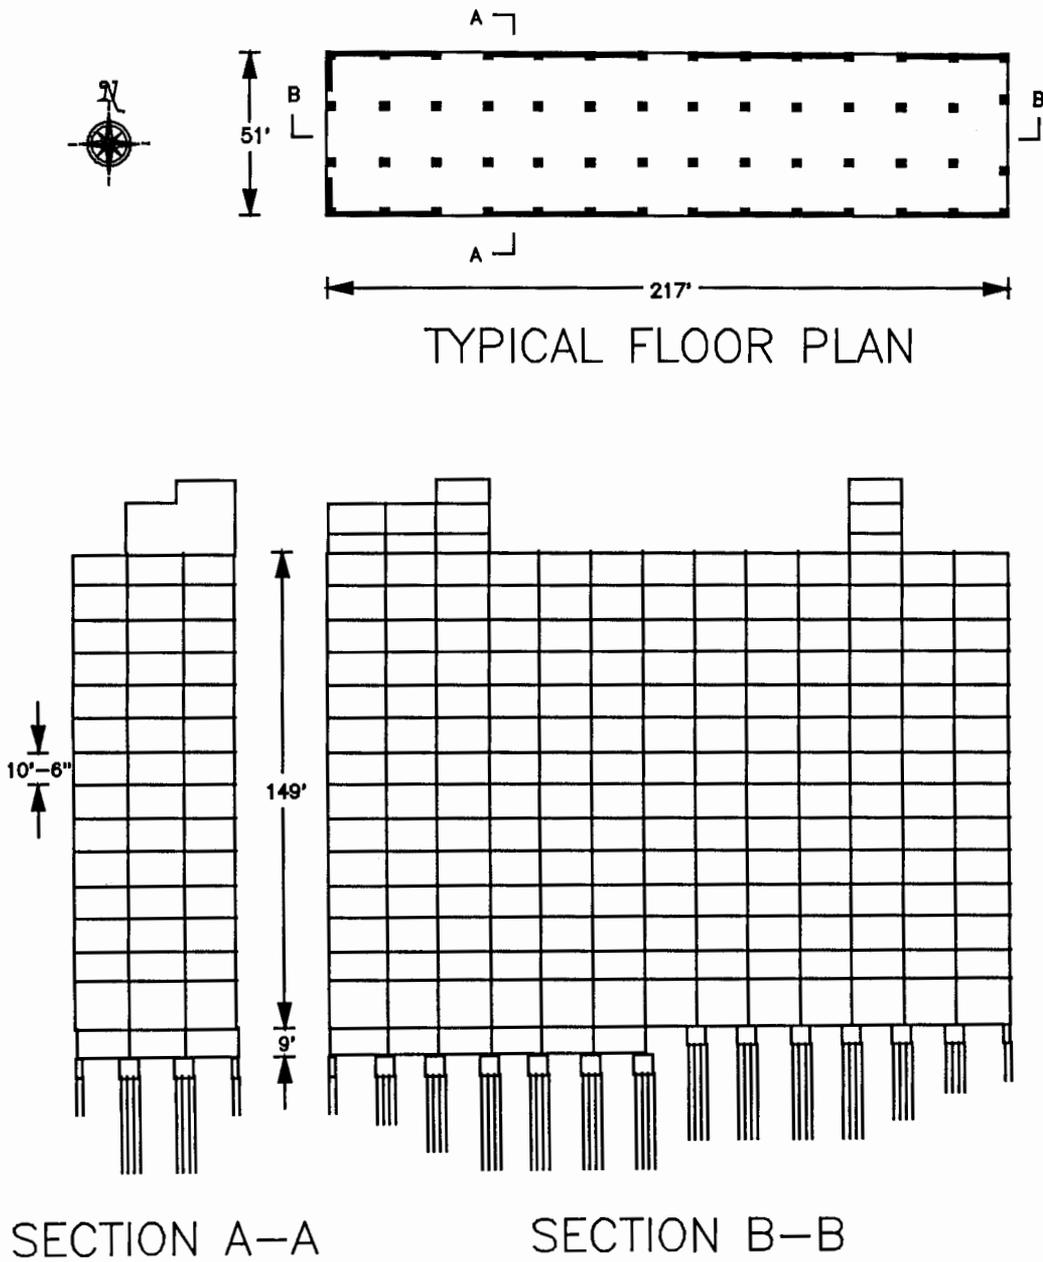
Structural Configuration of the Los Angeles Warehouse Building
